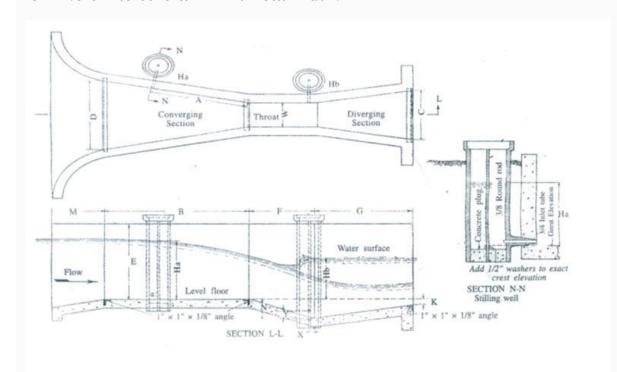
Plan and elevation of a concrete Parshall flume showing component parts. (Source: Michael, 2009)
